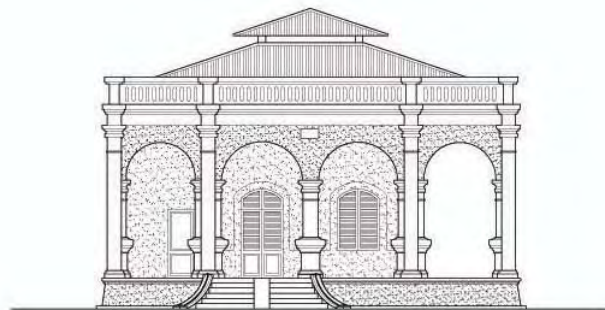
Headquarters of French Artillery on Kinh Thien palace plan, built in 1886
